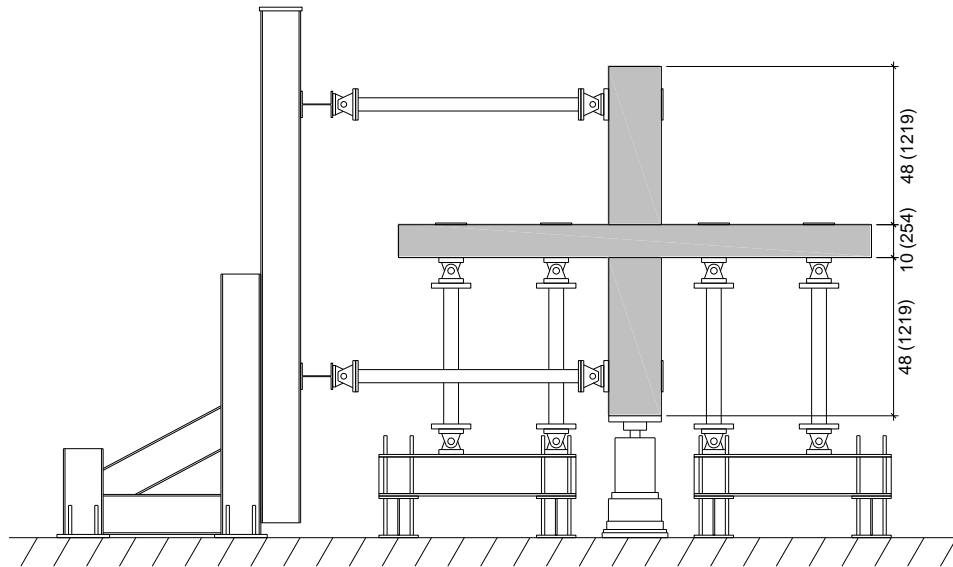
Specimen Geometry; West Elevation [in. (mm)]
